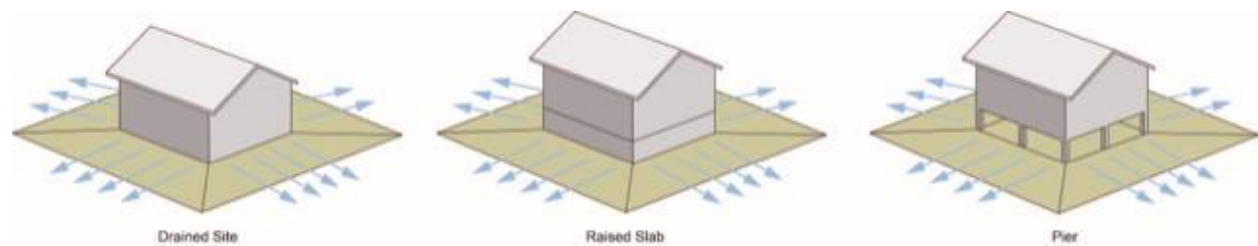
Elevate the Structure - All flood risk is reduced where the building floors are located above the base flood elevation (BFE) and where the slope of the land directs water away from the building. Raised slab and elevated pier foundations tend to be more robust and lower risk than slab foundations and crawlspace foundations.
